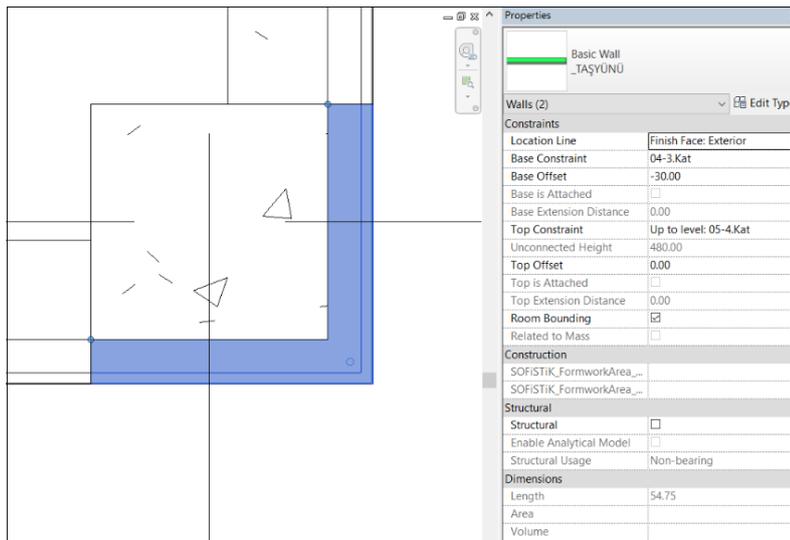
A Proper Joint of Insulation Elements in 2D Plan
